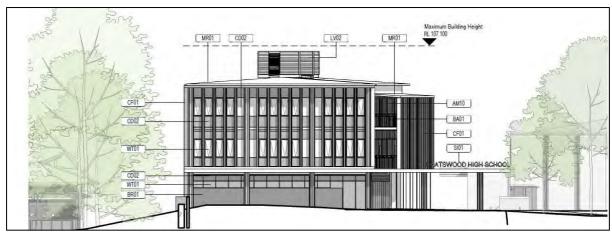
| CHS proposed Building Q north (Centennial Avenue) elevation (Source: EIS 2020)
